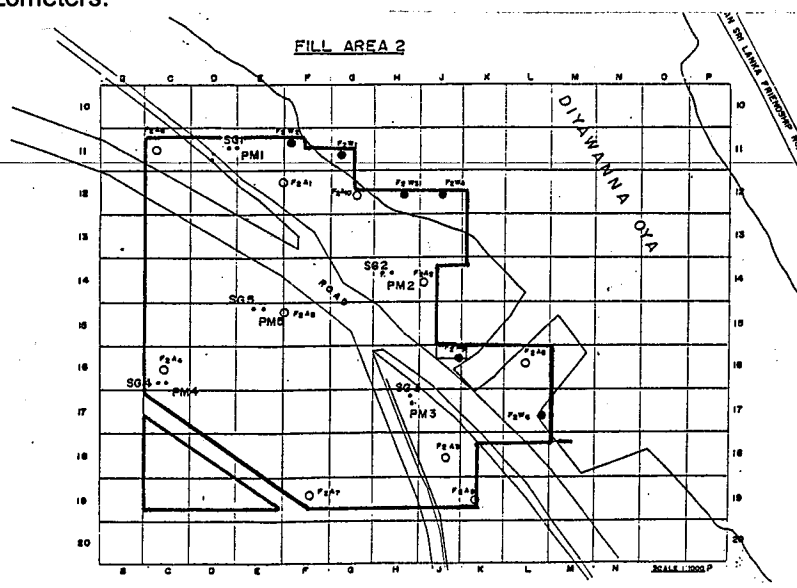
SITE PLAN OF THE INSTRUMENTED FILL AREA.
